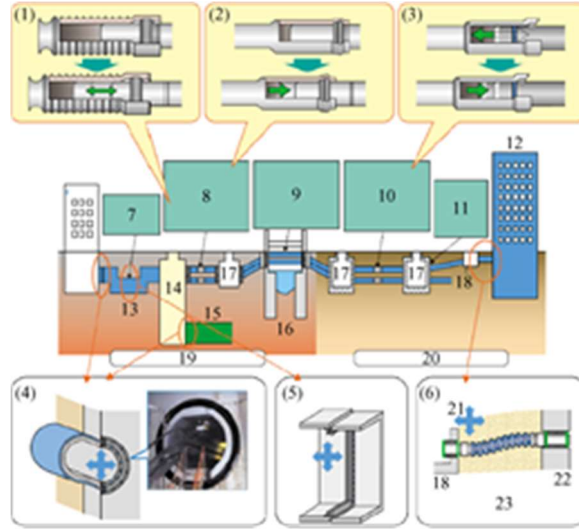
Examples Of Precautionary Measures For The Protection Of The Underground Line And Cable Structures From The Experience Of Japanese Telecommunications Specialists: (1) Sliding Connection For Inspection Wells—Connecting Pipeline Coupling; (2) Sliding Connection For Gas Pipelines; (3) Sliding Connection With Stopper; (4) Flexible Connection For Penetrating The Wall Of The Cable Shaft; (5) Flexible Connection Of Cable Channels; (6) Flexible Connection Of Sections Of The Gas Pipeline For Penetration Into The Building; (7) Flexible Connection; (8) Sliding Connection And Coupling; (9) Sliding Connection With Stopper And Concrete Cable Tray; (10) Sliding Connection With Stopper And Coupling; (11) Reinforced Concrete Manhole Cover; (12) Building Of The User Of Services; (13) Cable Channel; (14) Cable Mine; (15) Cable Sewerage; (16) Penetration Of The Bridge Crossing; (17) Inspection Well; (18) Inspection Well; (19) Regular Soil; (20) Water-Saturated Soil; (21) Directions Of Displacements; (22) The Wall Of The Building; (23) Flexible Corrugated Gas Pipeline [27]
